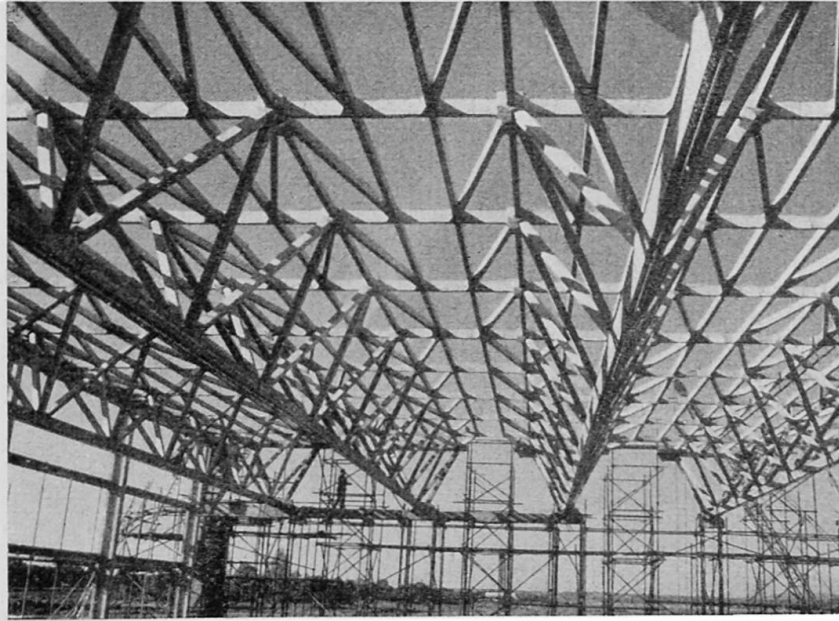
Transair Hangar at Gatwick Airport of prestressed precast concrete.
